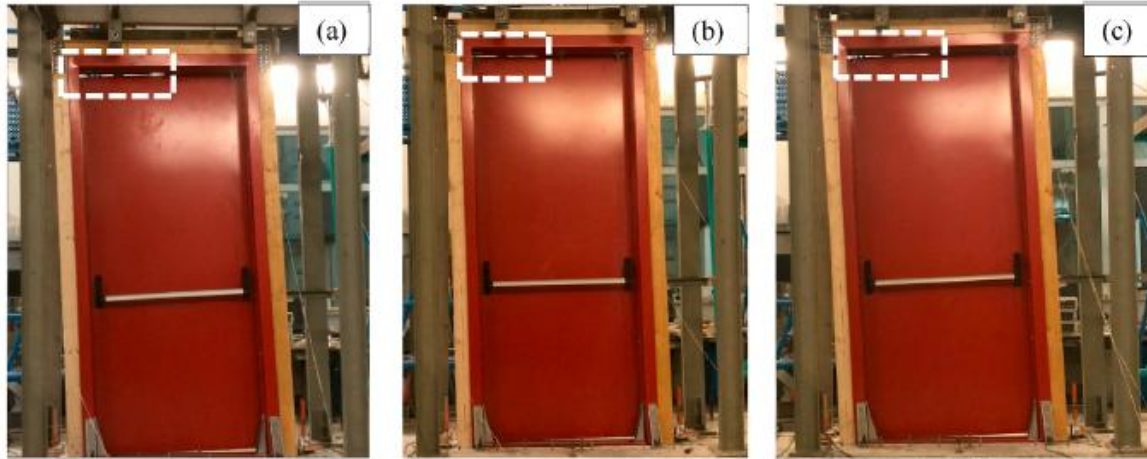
Observed damage to fire door sets under lateral drift [Calayir et al., 2022]: (a–c) Permanent distortion of three 90-min fire door specimens at their failure inter-story drifts (~1.9–2.3% IDR) – note large gap openings at top corners and tearing near the locks
